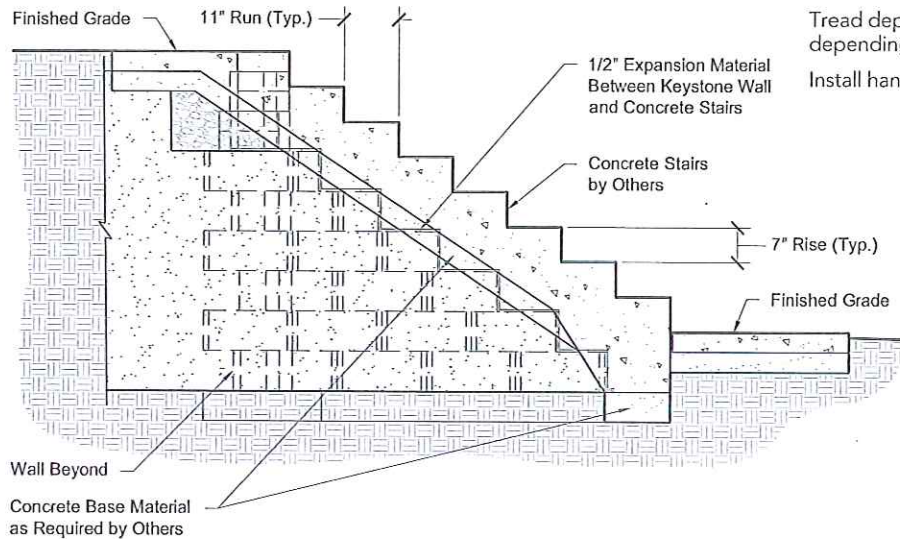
STAIR IN WALL DETAIL ELEVATION
